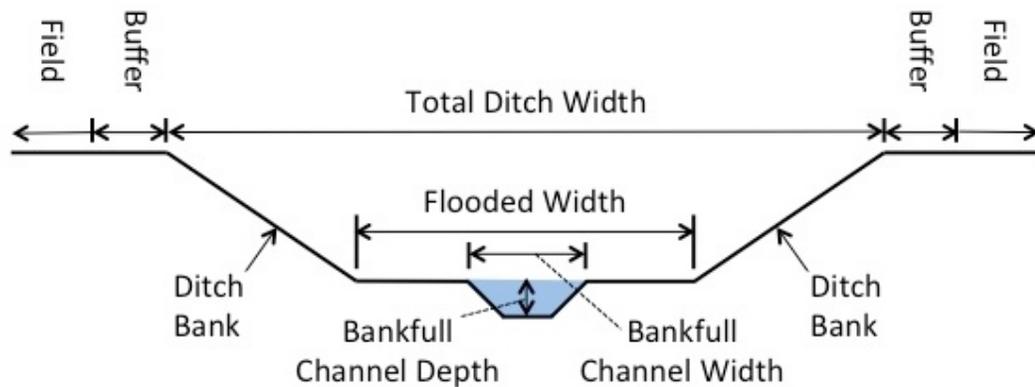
A Two-Stage Drainage Ditch Cross-Section.
